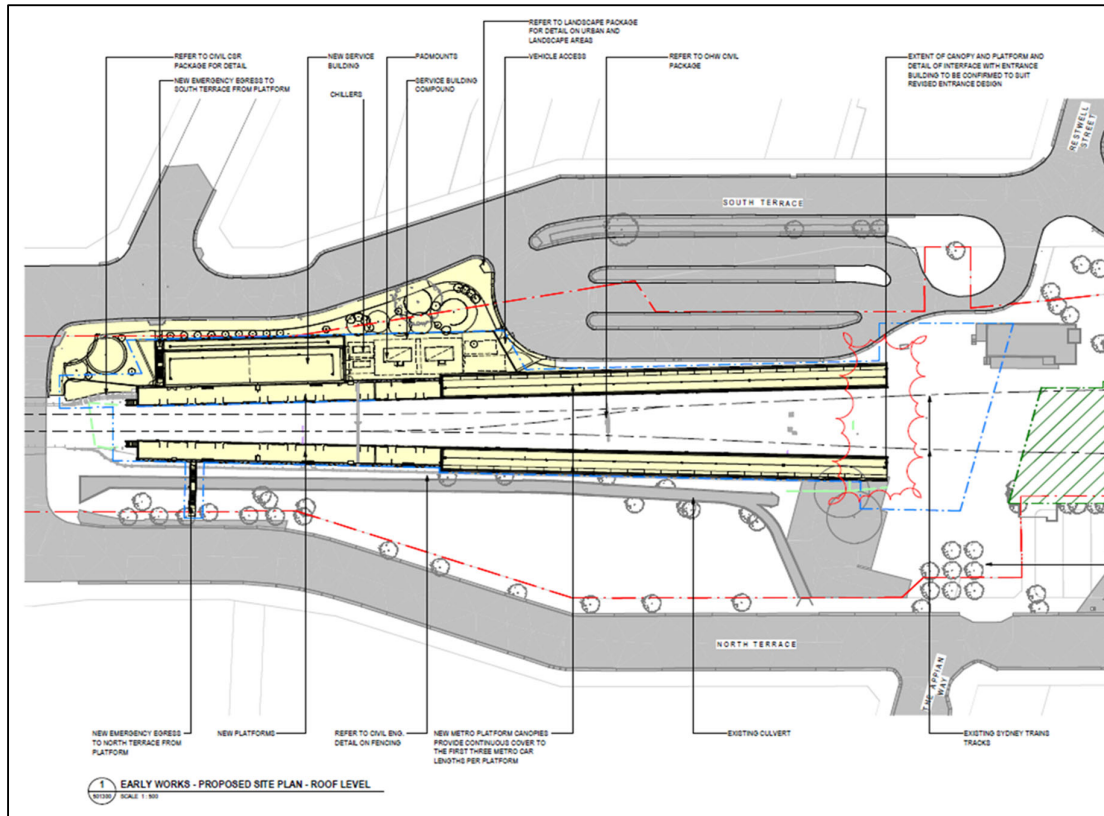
Bankstown Early Works scope (source: Metro T2M – Bankstown Station Design & precinct Plan – Sydney Metro Southwest Metro Design Services, 2021)
